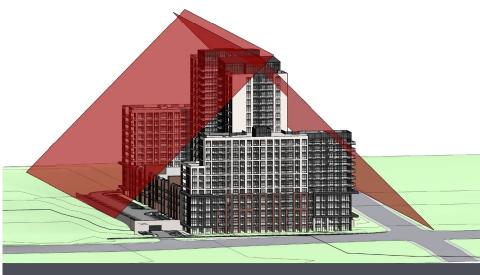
45 degree angular plan demonstration schematic (east elevation)
